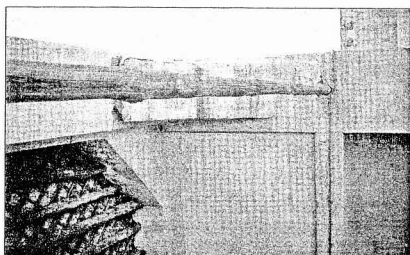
Mangrove Pole, used here as both roof joists and cross-bracing.
